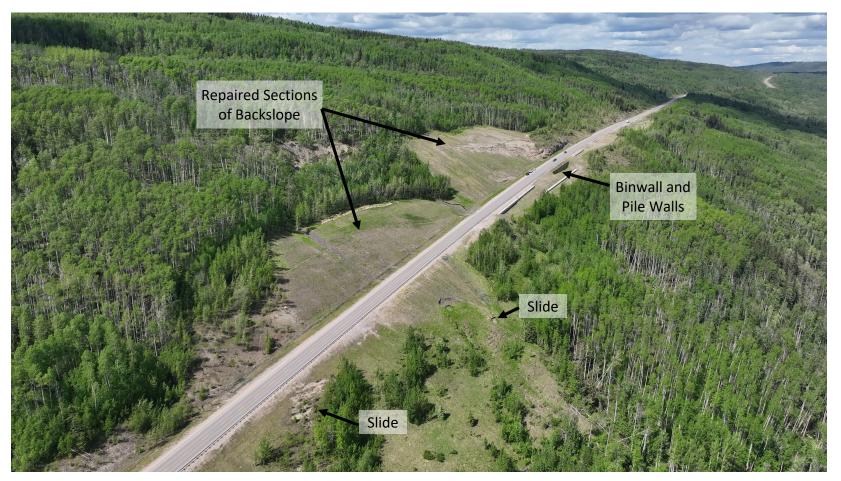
South portion of site. Note slides on east (downslope) side of Hwy 40:36. UAV photo taken June 2, 2025, facing northeast.
